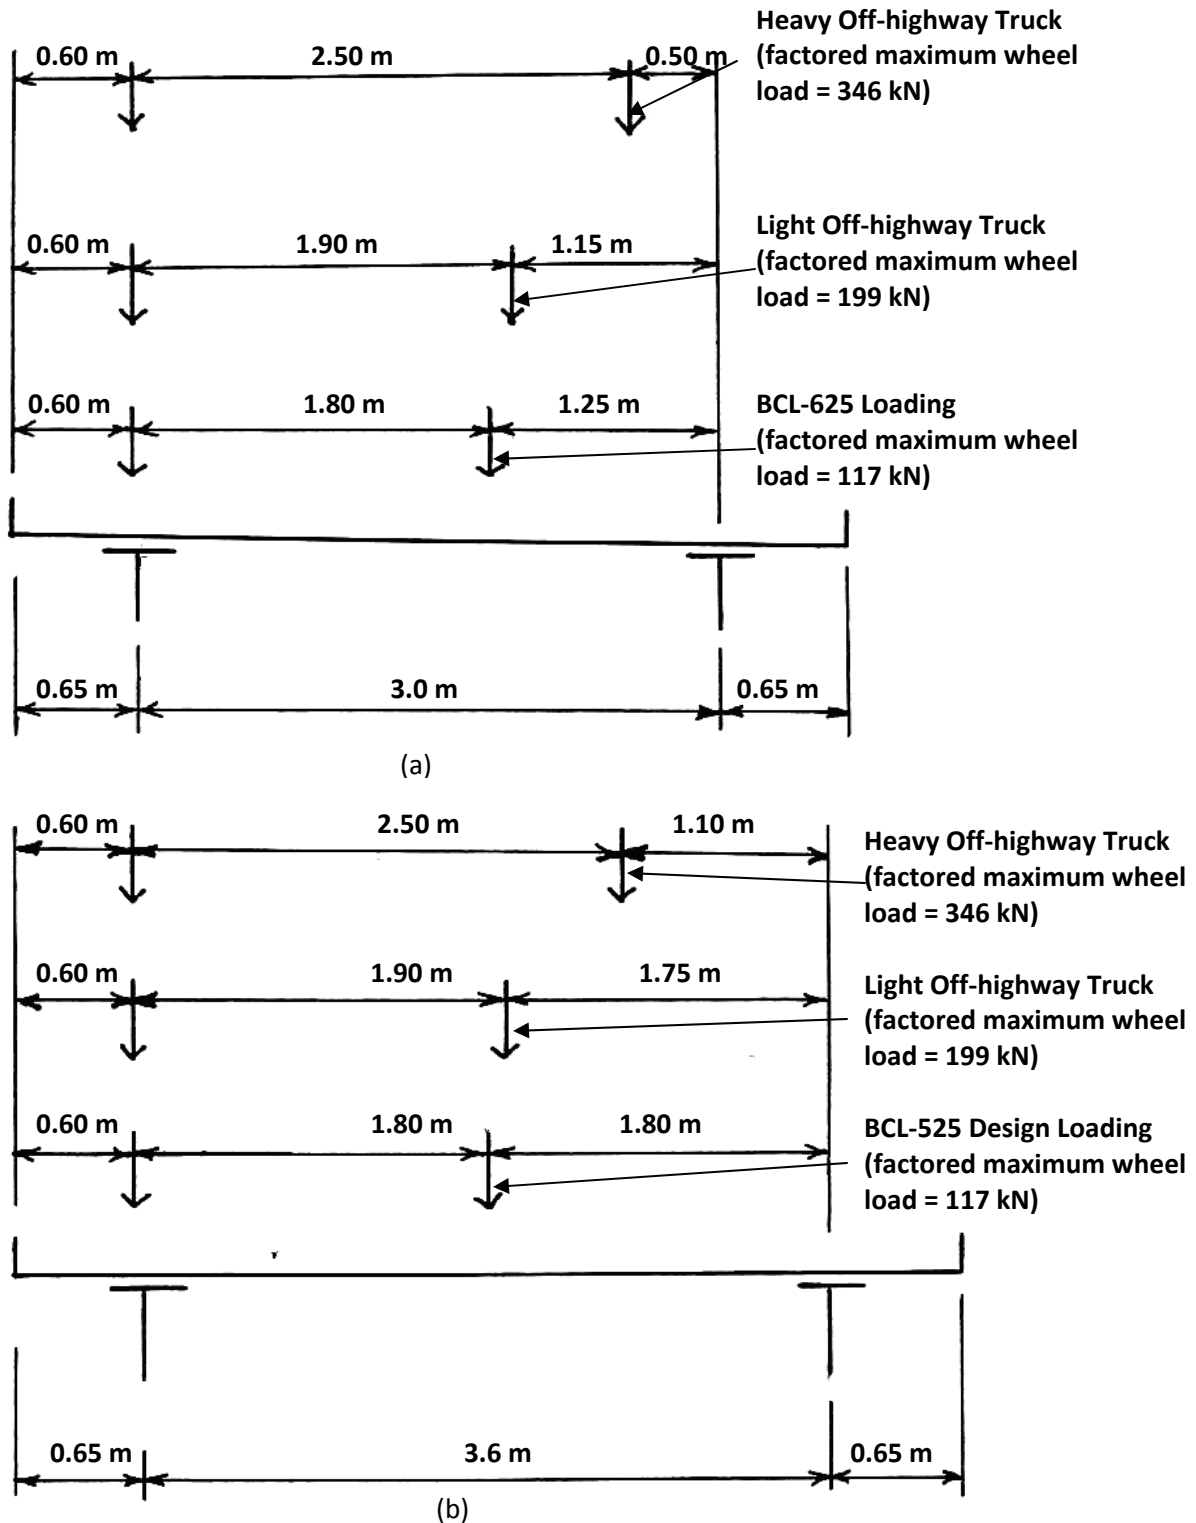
Transverse position of design vehicles on timber deck: (a) on girder spaced at 3.0 m, (b) on girders spaced at 3.6 m (Note: Maximum wheel loads in Heavy and Light Off-highway Trucks are obtained on 60:40 basis, and those for BCL-525 Design loading on 50:50 basis)
